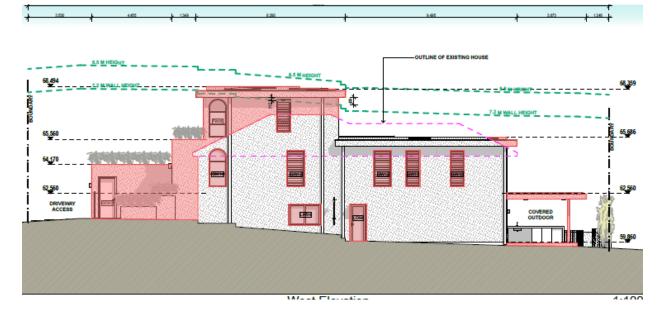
Plan extract indicating area of increased view opportunity for western properties due to the removal of the existing pitched roof over the southern portion of the dwelling
